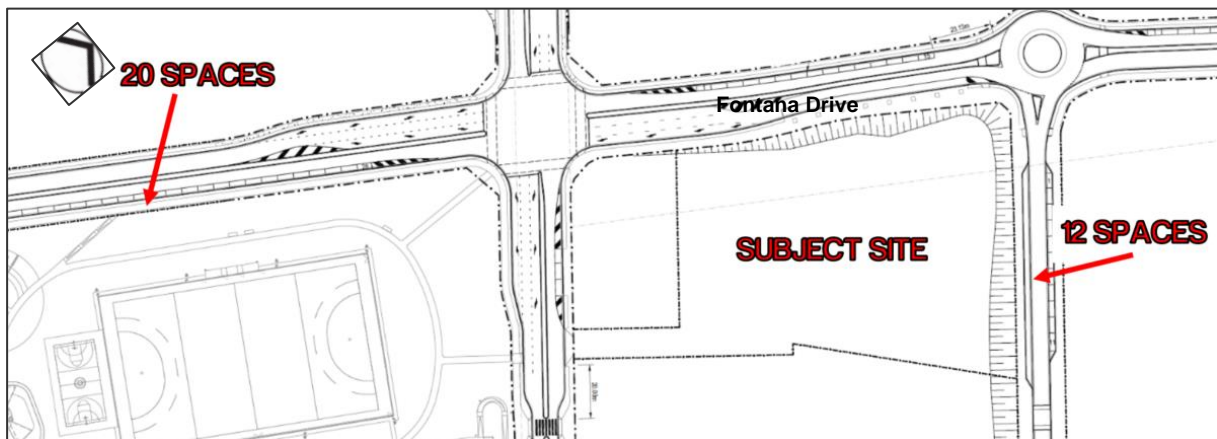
| School drop-off / pick-up zone (Source: Applicant's RtS)
